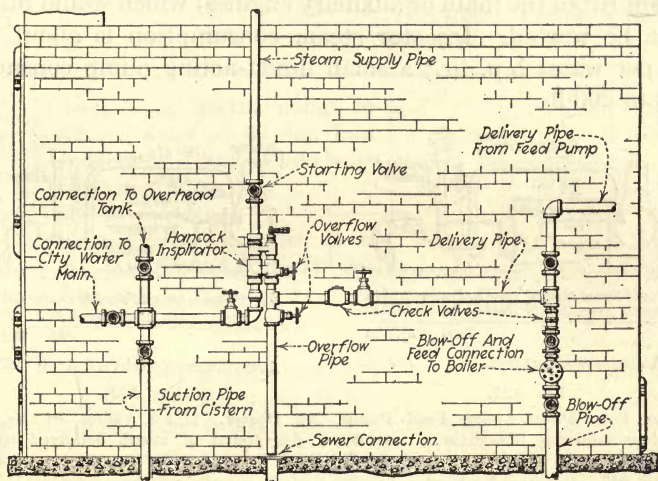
An Inspirator Type Of Injector Piped Up For Boiler Feeding.
